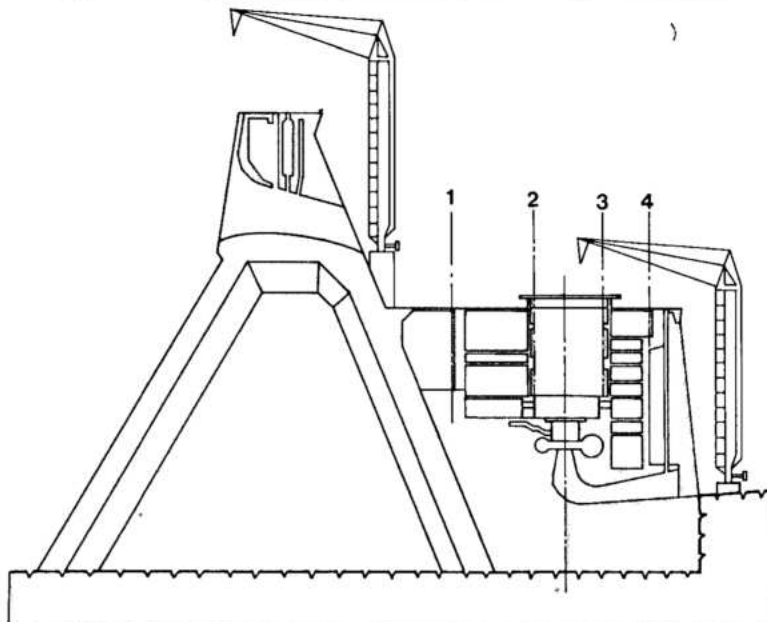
Concrete placement in main dam and powerhouse equipment and stages
